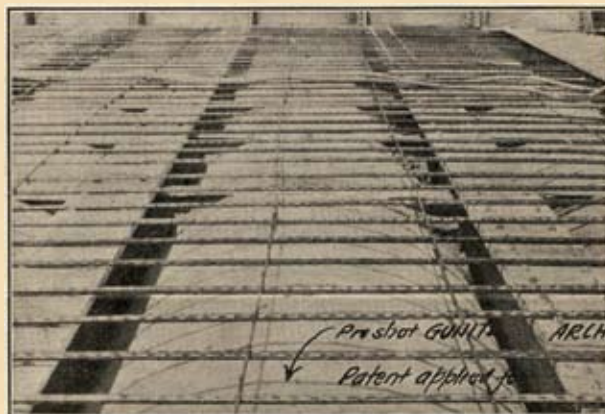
SHOWING PRE-SHOT ARCH SLAB CONSTRUCTION BEFORE CONCRETE DECK WAS POURED
